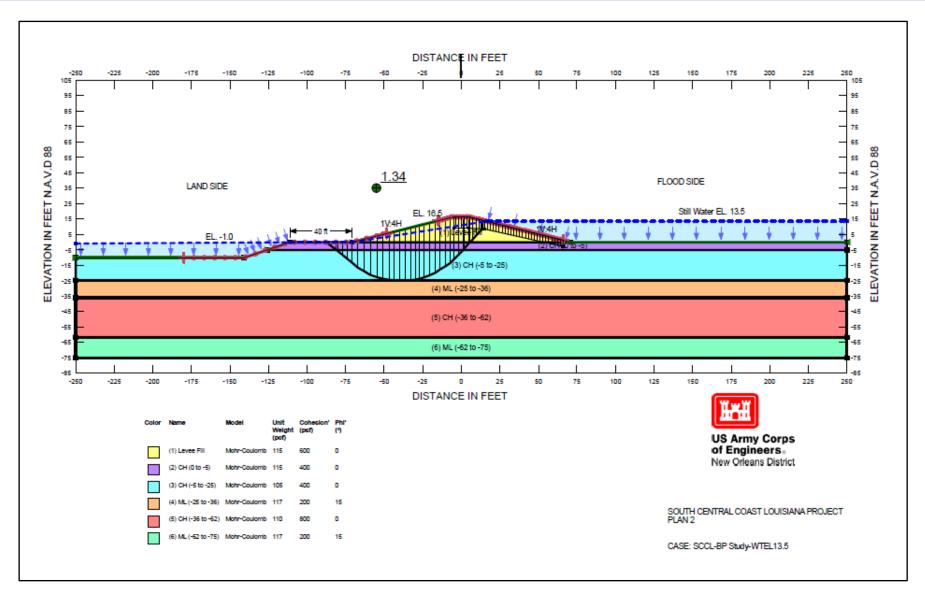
Plan 2 Levees – Slope Stability Analysis for Still Water Elevation.
